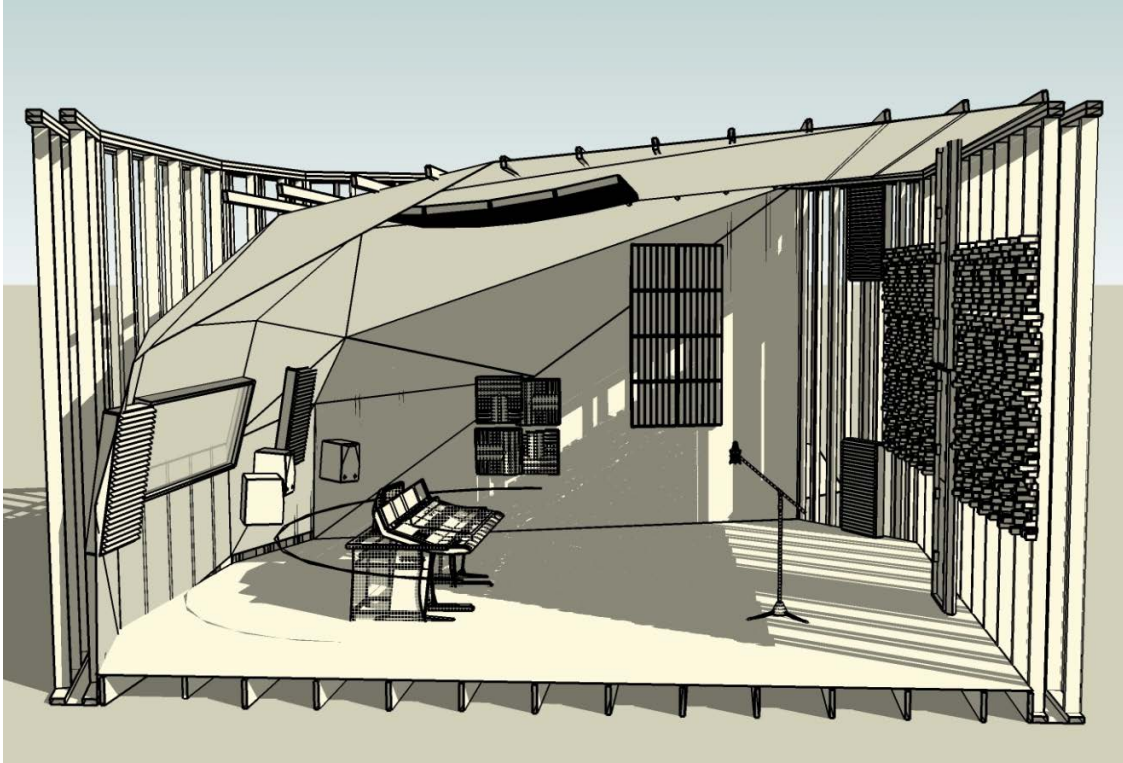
Side section of proposed control room design, illustrating diffuser placement. Diffusers are located the on the back wall, ceiling, and sidewalls. For a longer ITDG, the ceiling and sidewall diffusers may be moved back from the listening position. The front end contains heavy absorption to create a reflection free zone around the listener.
